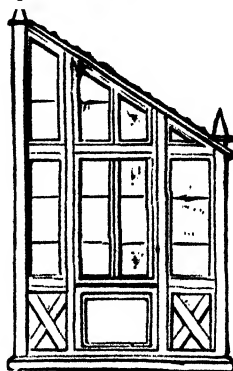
GREENHOUSE (SIDE OR END ELEVATION).
